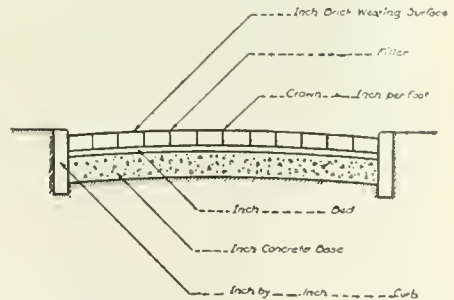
THIS IS A WELL-KNOWN FORM OF BRICK PAVEMENT, ON A CONCRETE BASE, FOR CITY STREETS.
